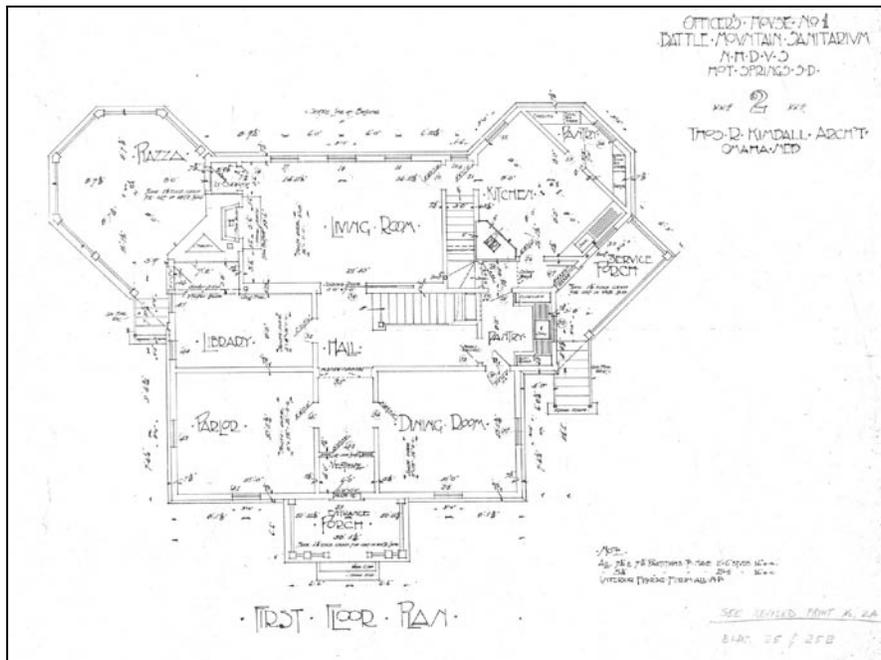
Thomas Rogers Kimball, First Floor Plan, "Officer's House No. 1."
